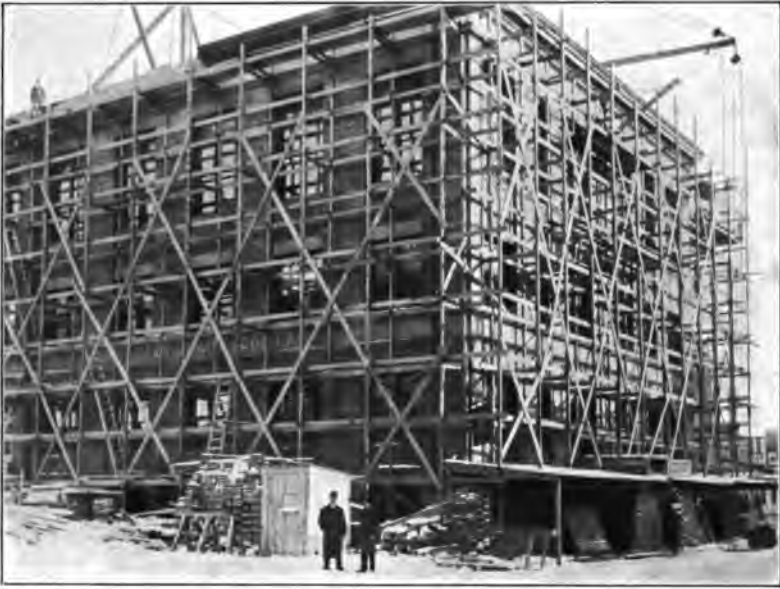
A WELL-BRACED AMERICAN SCAFFOLD.
